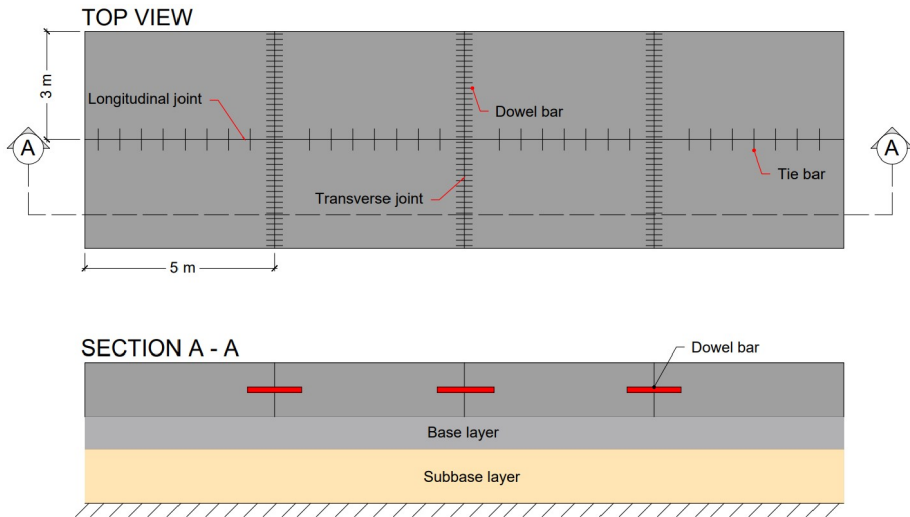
Top and sectional view of jointed plain concrete pavement.
